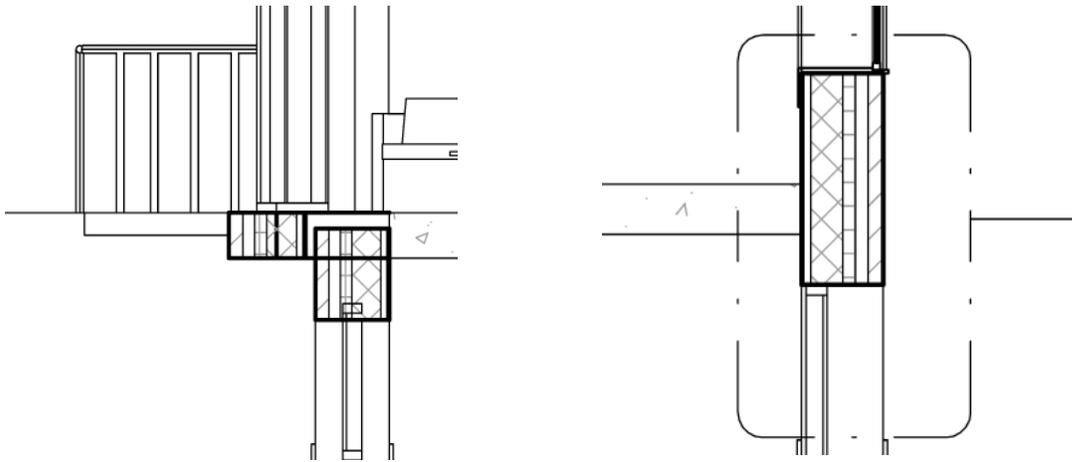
Section details from Revit Tutorial (Revit 2008).
